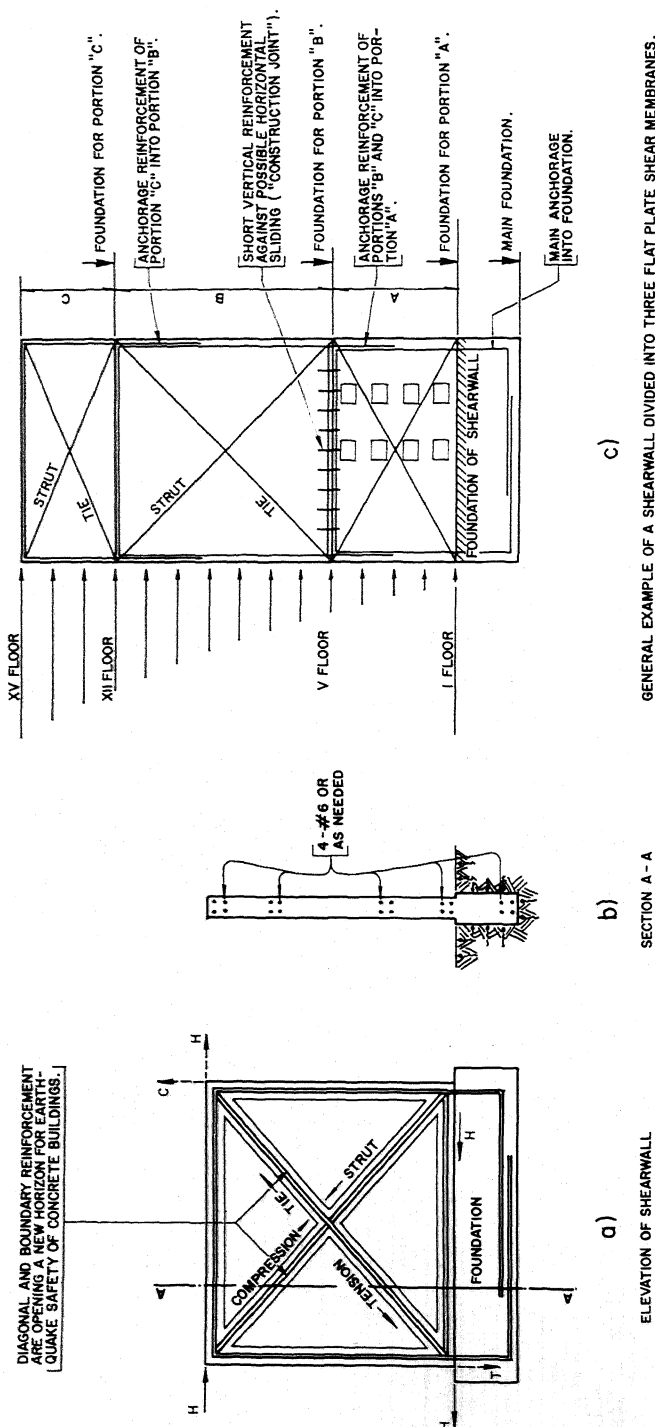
SHOWS A NEW CONCEPT OF SHEARWALL RIGIDITY ACHIEVED BY TRIANGULAR REINFORCEMENT OF A FLAT PLATE CONCRETE MEMBER WHERE DIAGONAL FORCES ARE CONTROLLED BY DIAGONAL REINFORCEMENT.
